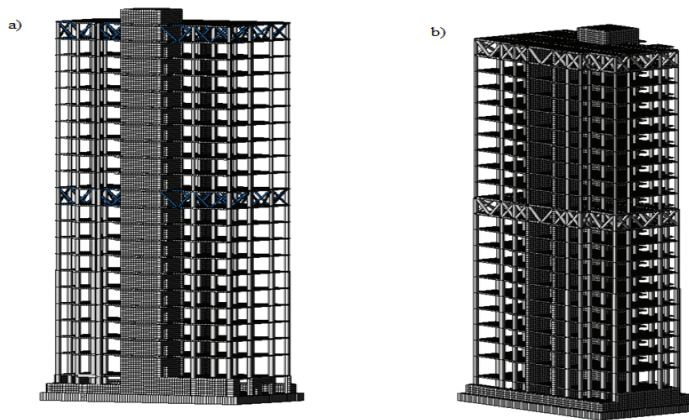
Calculation models with two outriggers: a) in metal structures; b) in reinforced concrete structures.
